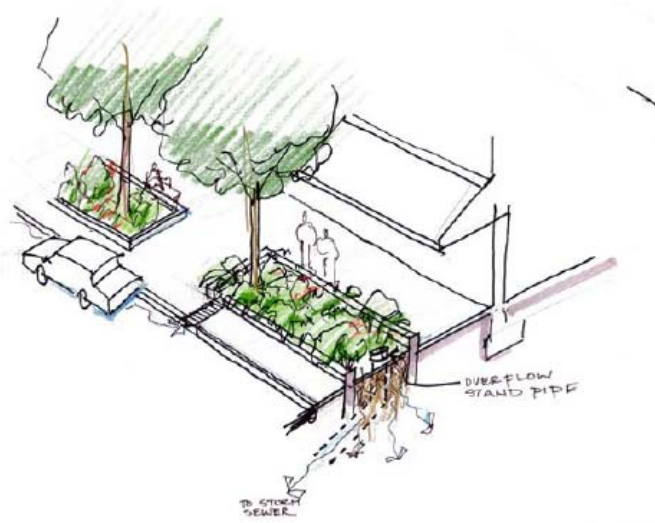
An example of a sidewalk planter garden. These can be either raised or at ground level.
